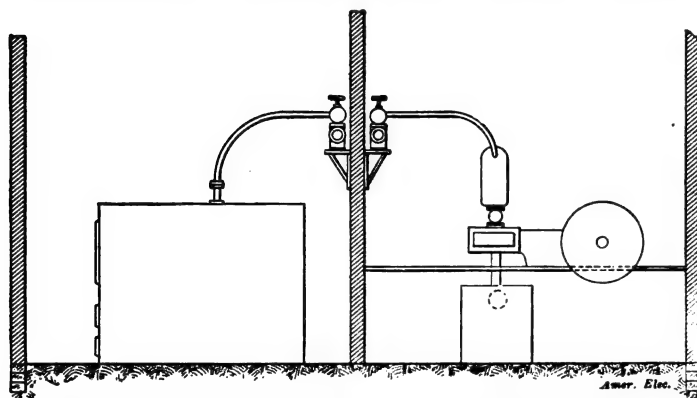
ELEVATION OF DUPLICATE STEAM PIPING SYSTEM.
